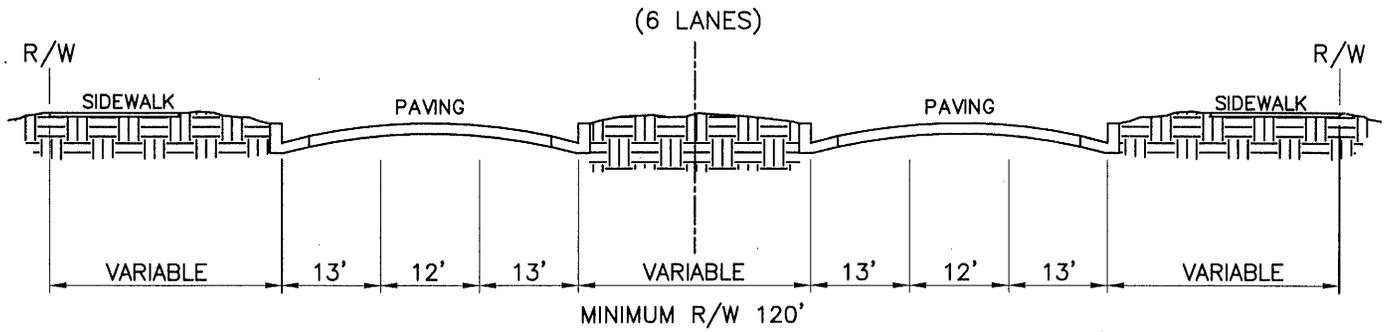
Creek County, Oklahoma Traffic Right-of-way and Roadway Construction Standards, 4 pages.
